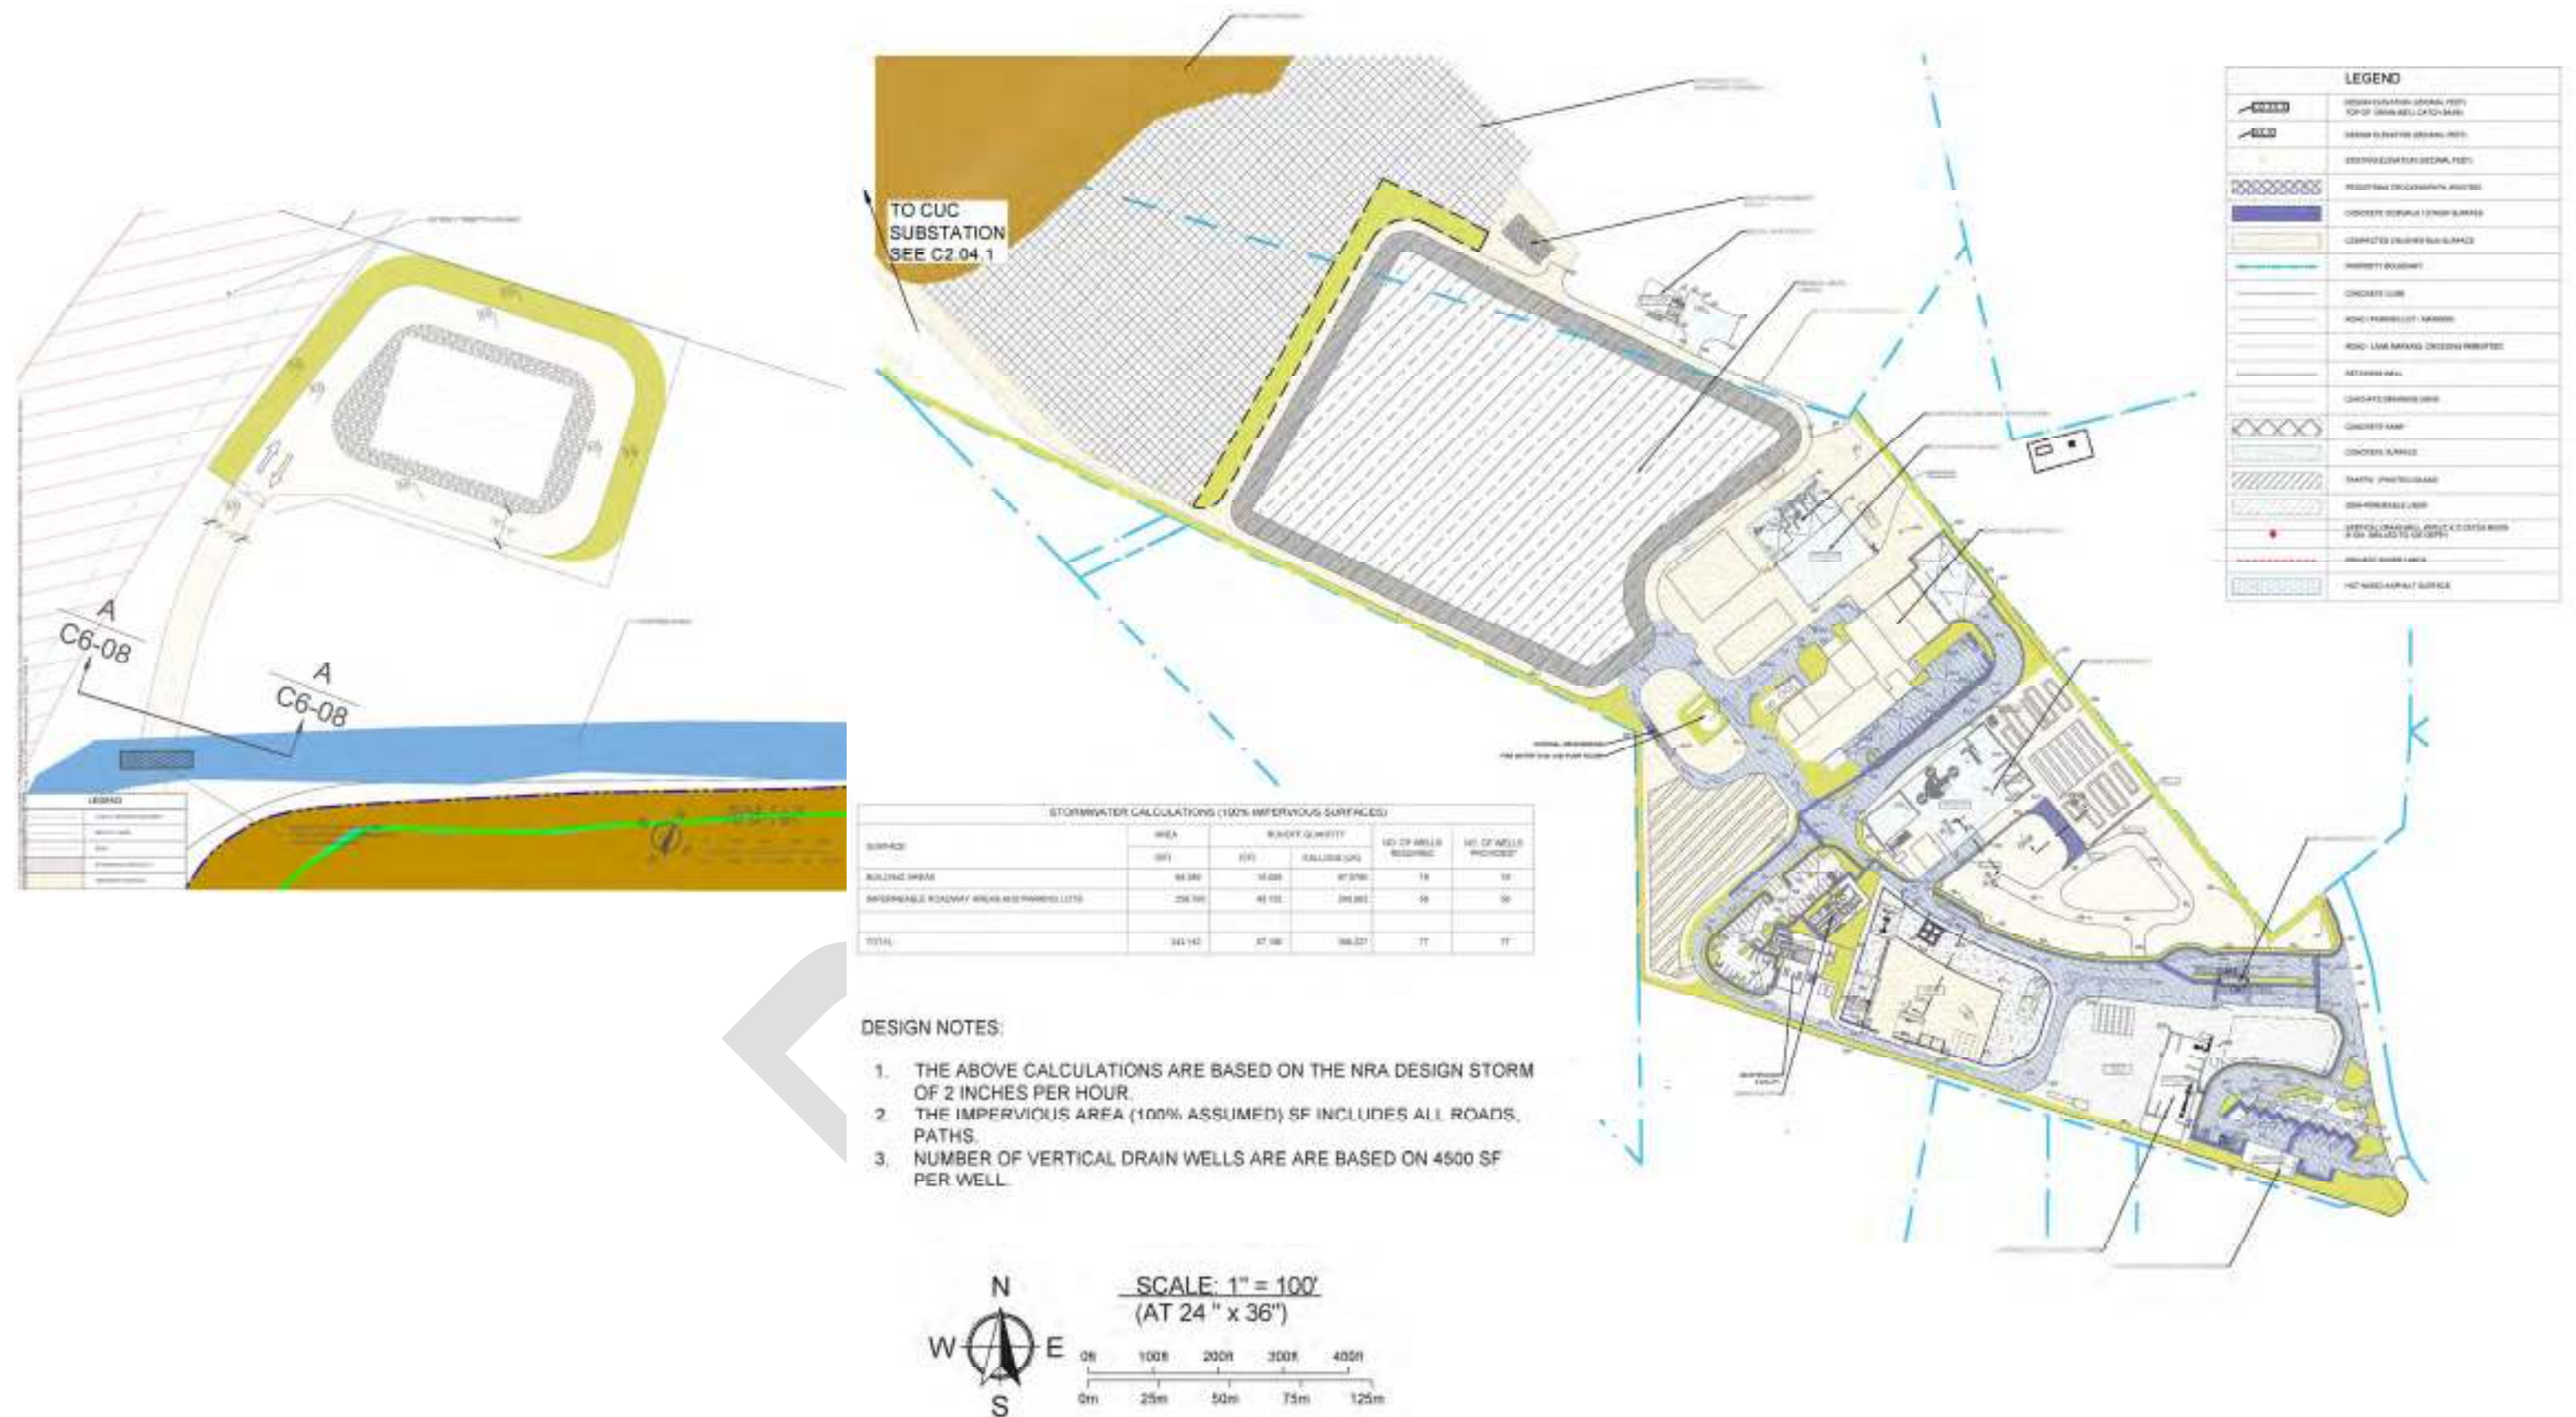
Stormwater Management Plan (right) and Interconnection Stormwater Management Plan (left)
